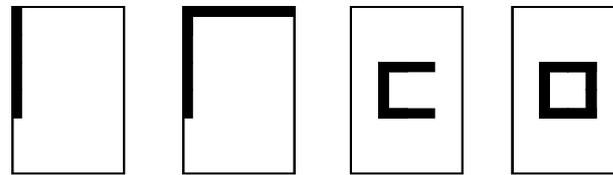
Plan shape of billboard: Type I, L, C and closed type
